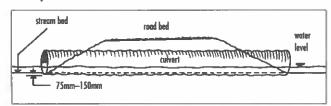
Install Culvert 75 mm to 150 mm below the stream bed.
